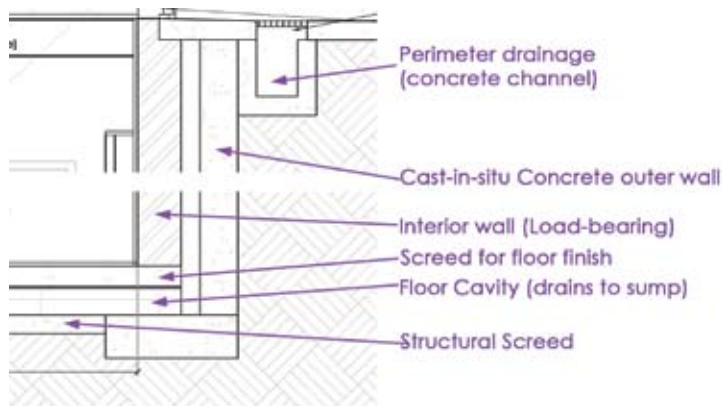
Perimeter detail to manage surface water where the new floor is level with existing site level
